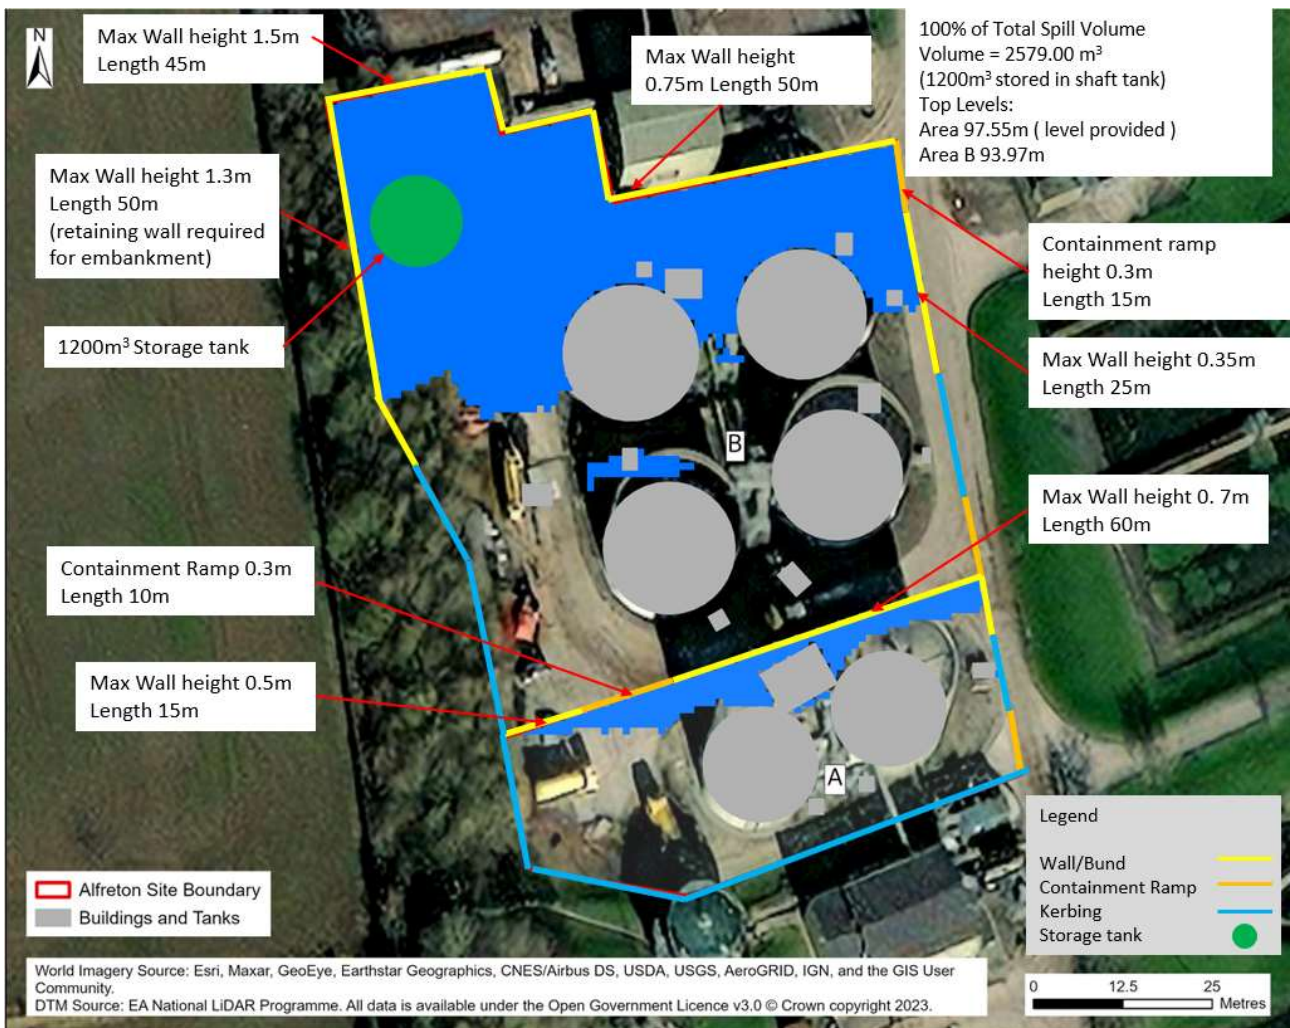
recommended modifications to provide secondary containment for scenario 1
